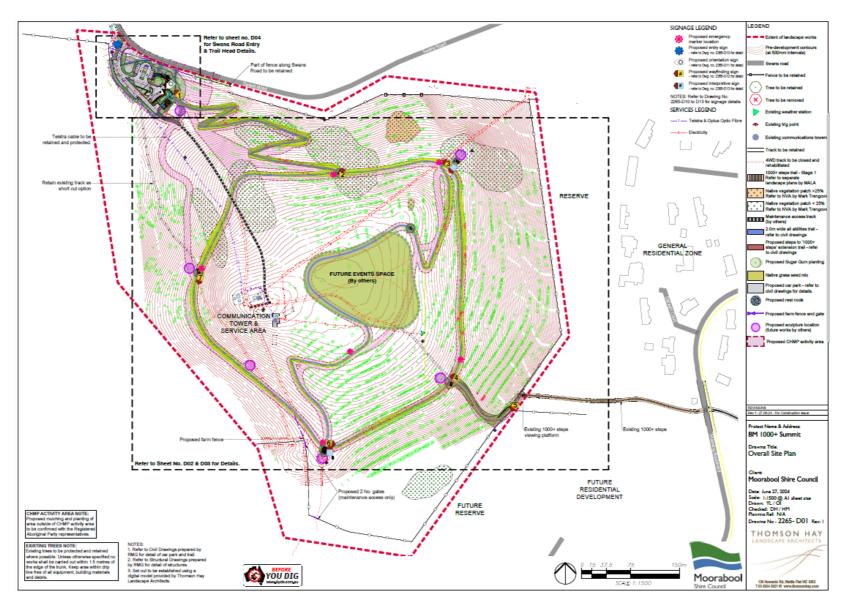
Bald Hill Stage 3 Overall Site Plan (Source: Thompson Hay Landscape Architects June 27, 2024)
